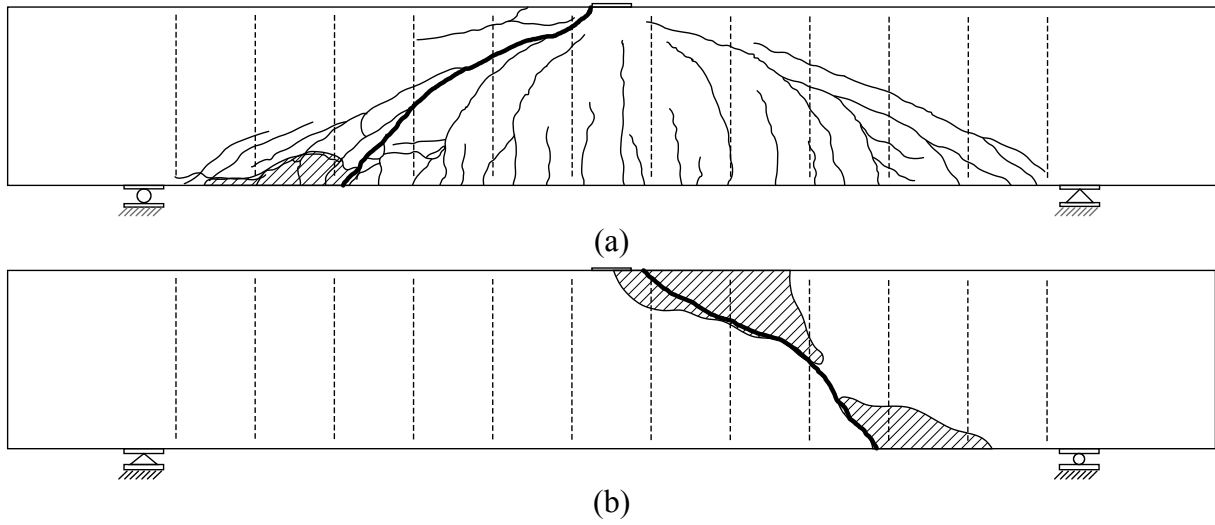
Observed damage in specimen P1S14, (a) front side, (b) back side
